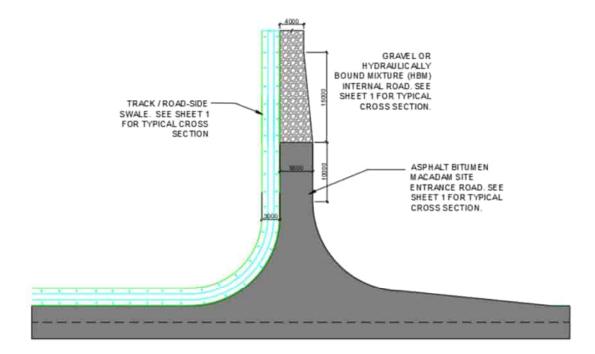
Typical Internal Road and Drainage Cross-section
